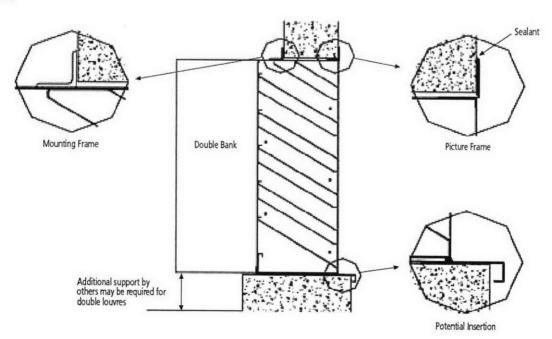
Alternative Structural Fixing Methods (showing suggested duct connection)
